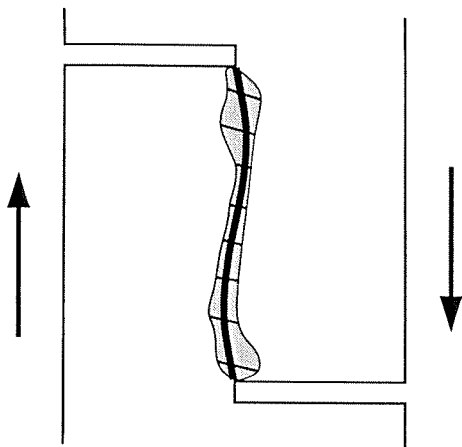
Spalling of AFRP-reinforced specimens
